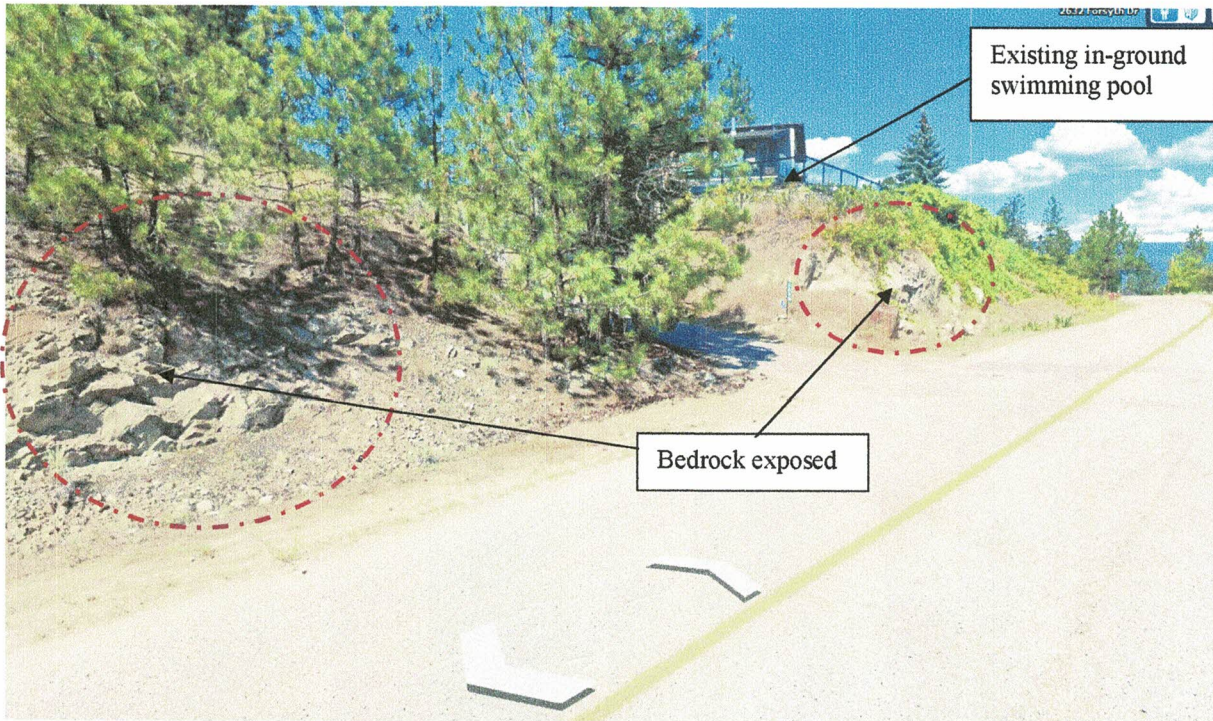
(Google Earth): Street view looking east up Forsyth Drive
